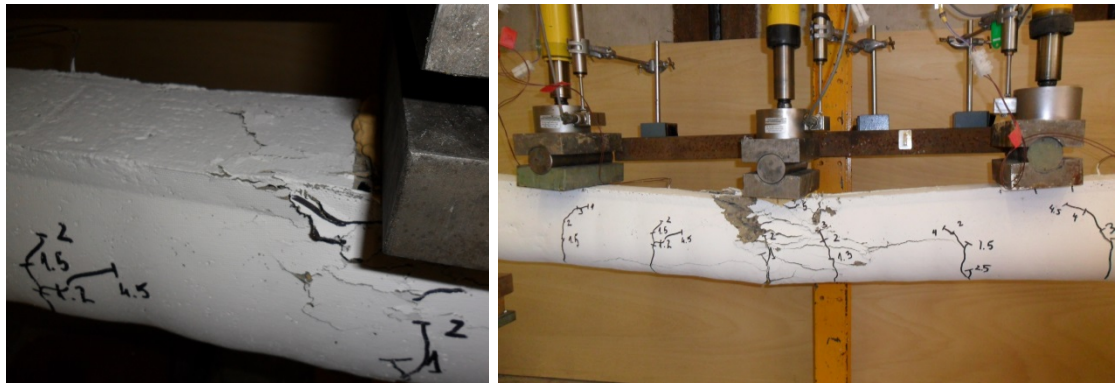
FFB 3 failure by concrete crushing in the compression zone
